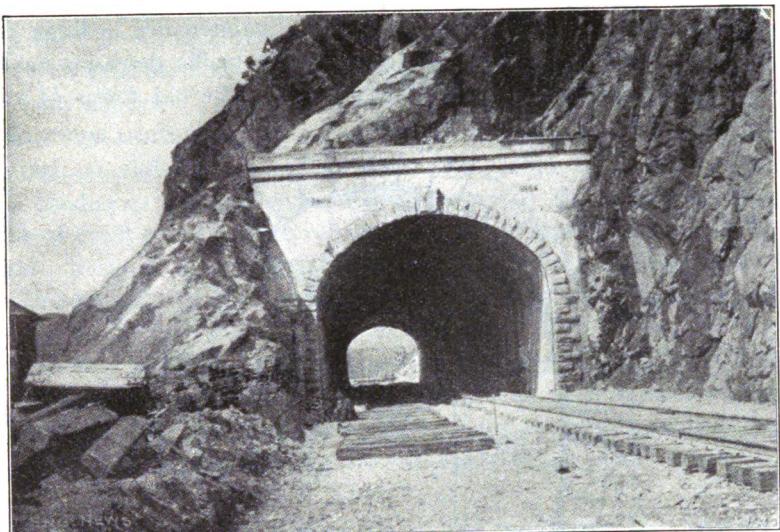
South Portal of Peekskill Tunnel, New York.
